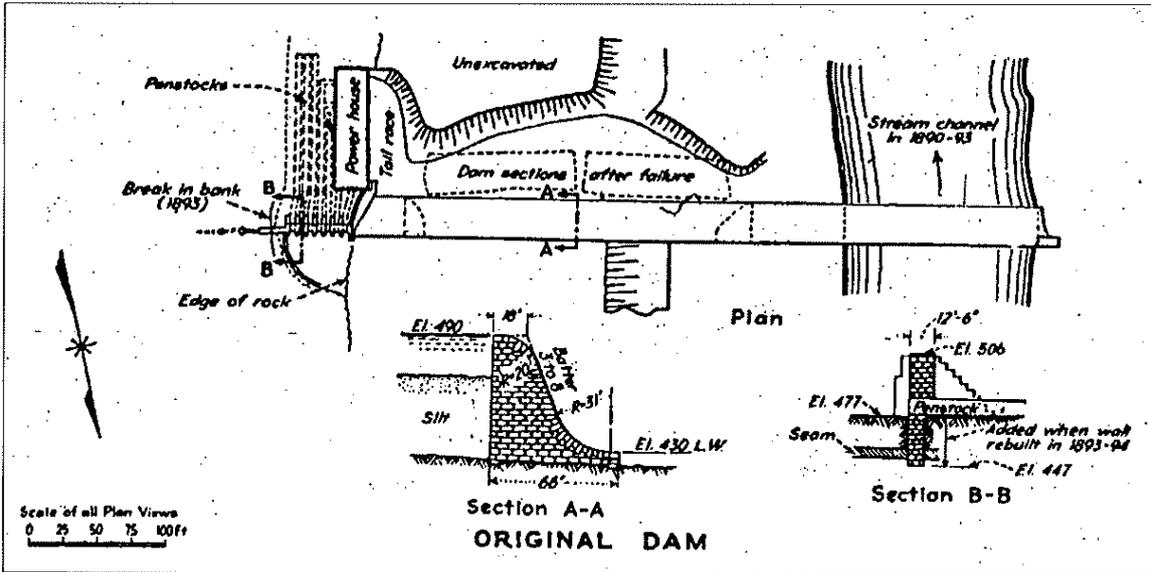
Plan and section of Austin Dam TX (after Engineering News Record, 1-30-1941)
